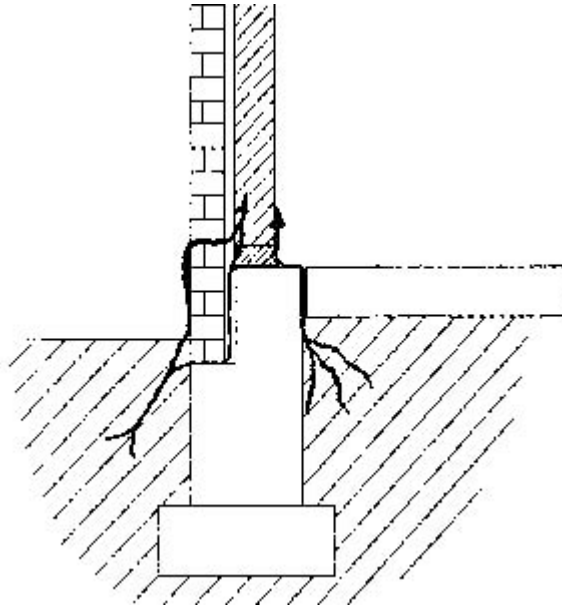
Poured foundation with brick veneer, with arrows indicating possible termite entry points
